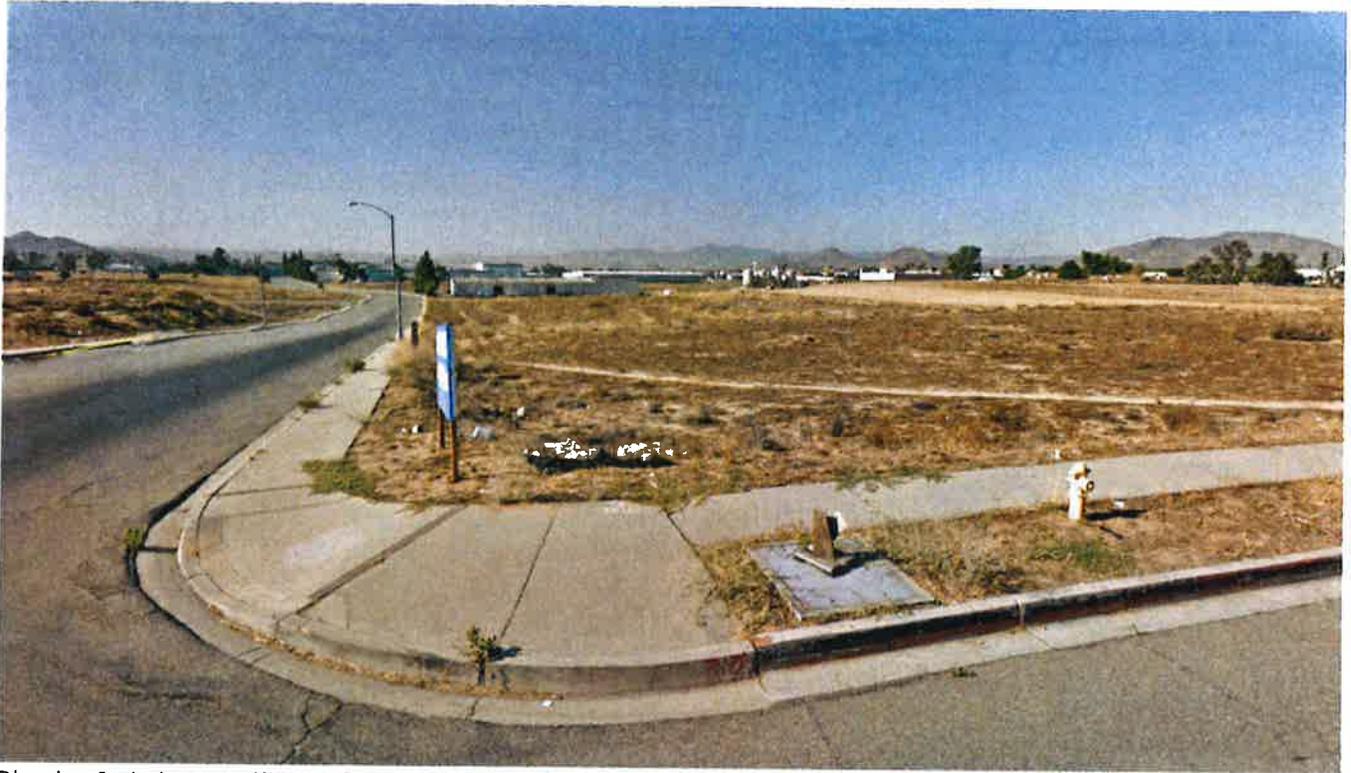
Intersection of San Bernardino Avenue and Wildrose Avenue, Facing South towards Planning areas 2, 3, and 4
